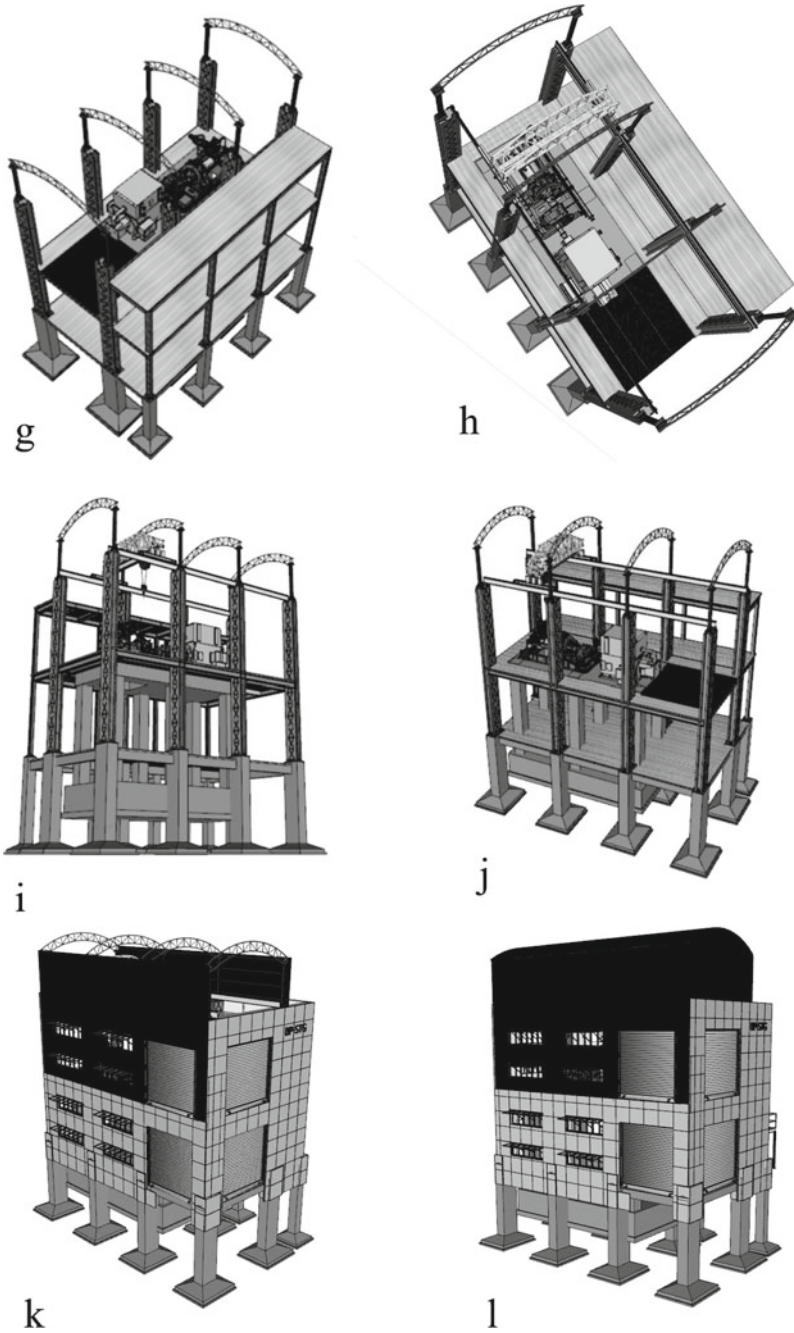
Structure installation sequence—g Construction of flooring, h Erection of grated flooring, i Fabrication and erection of arch trusses, j Installation of EOT crane, k Installation of wall panels and exterior APC panel, and l Erection of roofing
